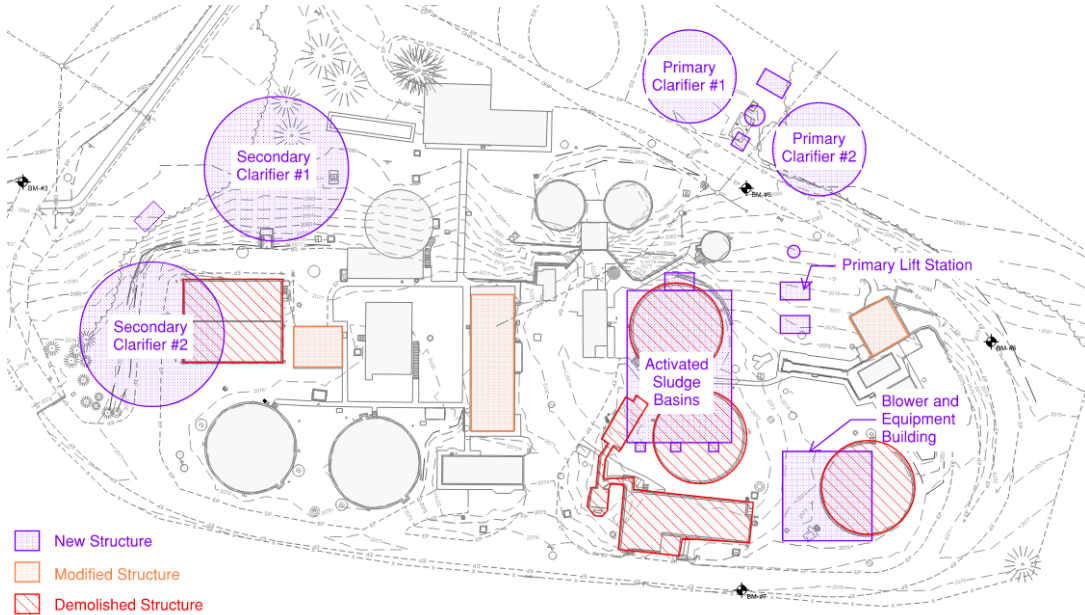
BALLASTED ACTIVATED SLUDGE
